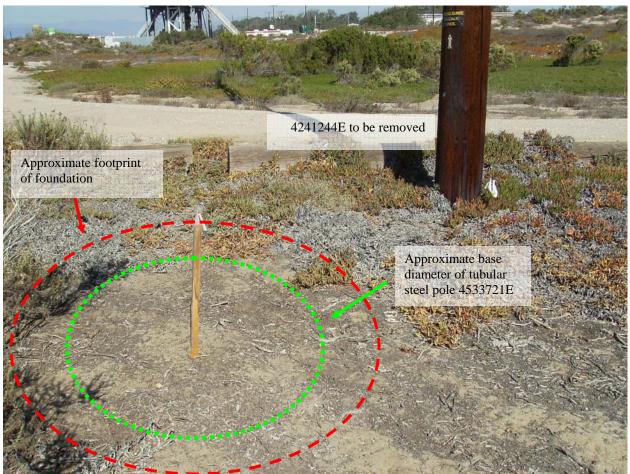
Pole No. 4241244E will be replaced by a tubular steel pole (TSP) 4533721E with a 7'-diameter concrete foundation (approximate footprint shown). Invasive iceplant is shown surrounding existing pole. Figure 11 below shows typical TSP foundation. See Figure 12 for general location.
